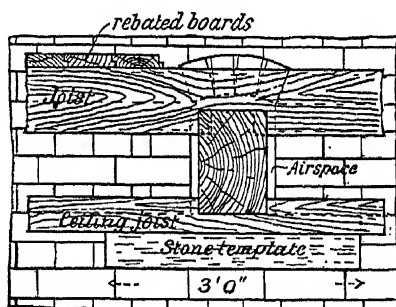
Vertical Section through Binder showing Air-space or Pocket in Elevation.
